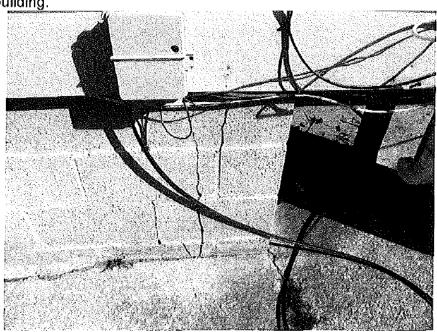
View of cracks in the foundation wall on the south side of the building.
